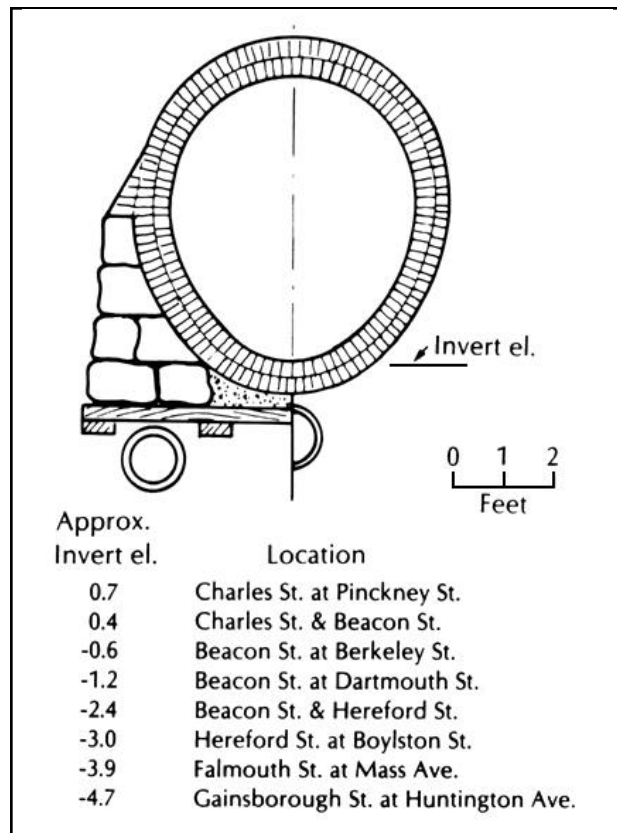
A typical cross section of the West Side Interceptor. Invert elevations at selected locations are noted.
